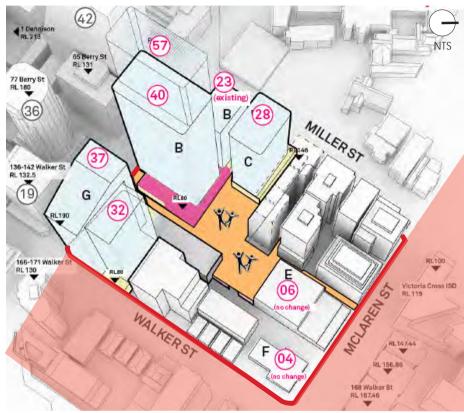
Ward Street Precinct masterplan massing (Adapted from NSC)
